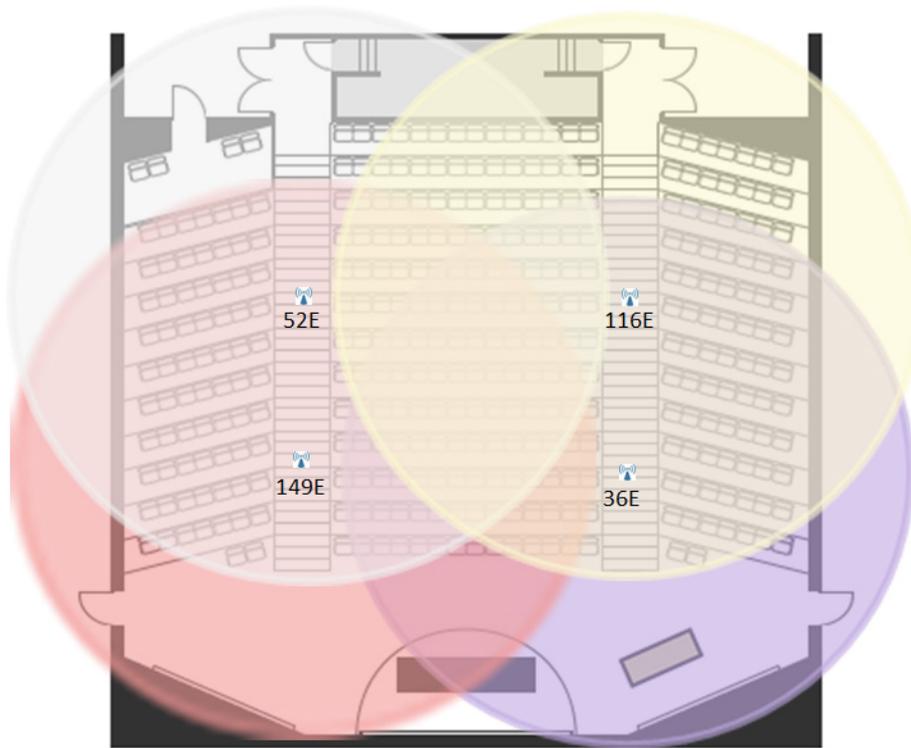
Auditorium AP Placement Plan and 5 GHz Channel Plan
